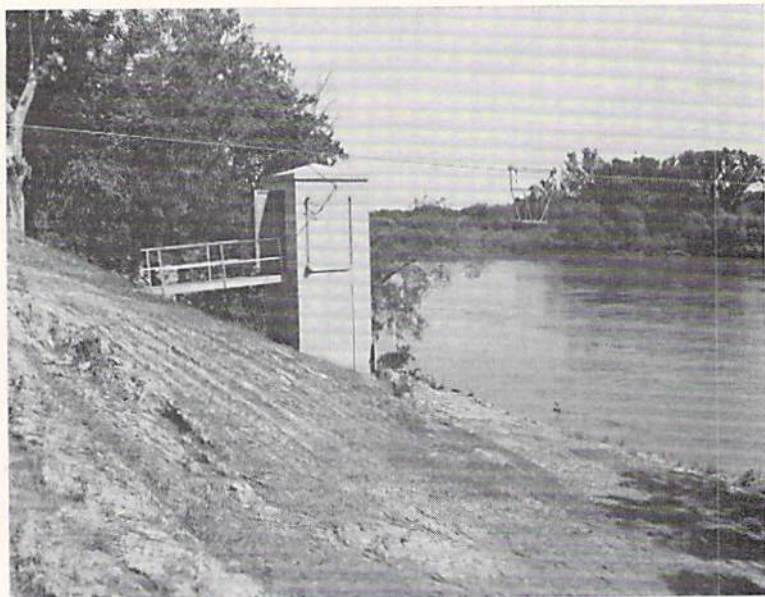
CONCRETE BLOCK GAGE HOUSE AND CABLEWAY MEASURING EQUIPMENT ON THE DES MOINES RIVER NEAR TRACY, IOWA.
